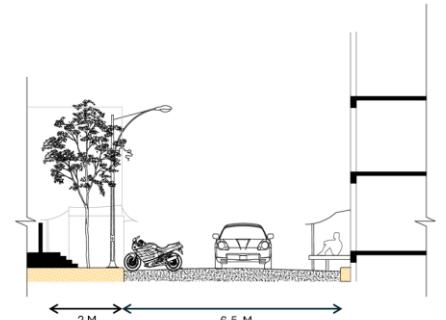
FIGURE : Section C-C' Through Annada Neogi Road (Secondary Roads) [SOURCE: Author]
